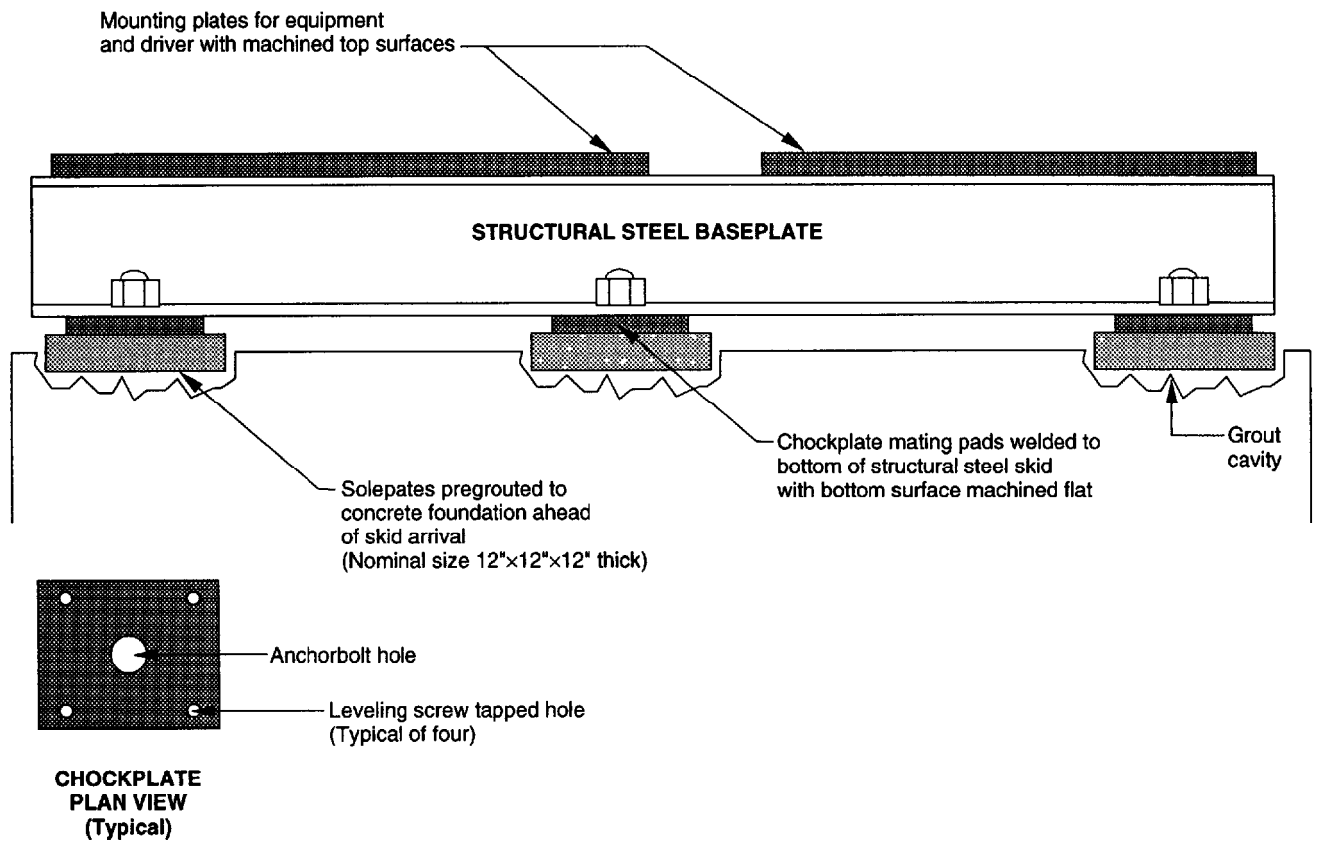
Typical Mounting Plate Arrangement for Baseplate Mounted Special-Purpose Equipment
